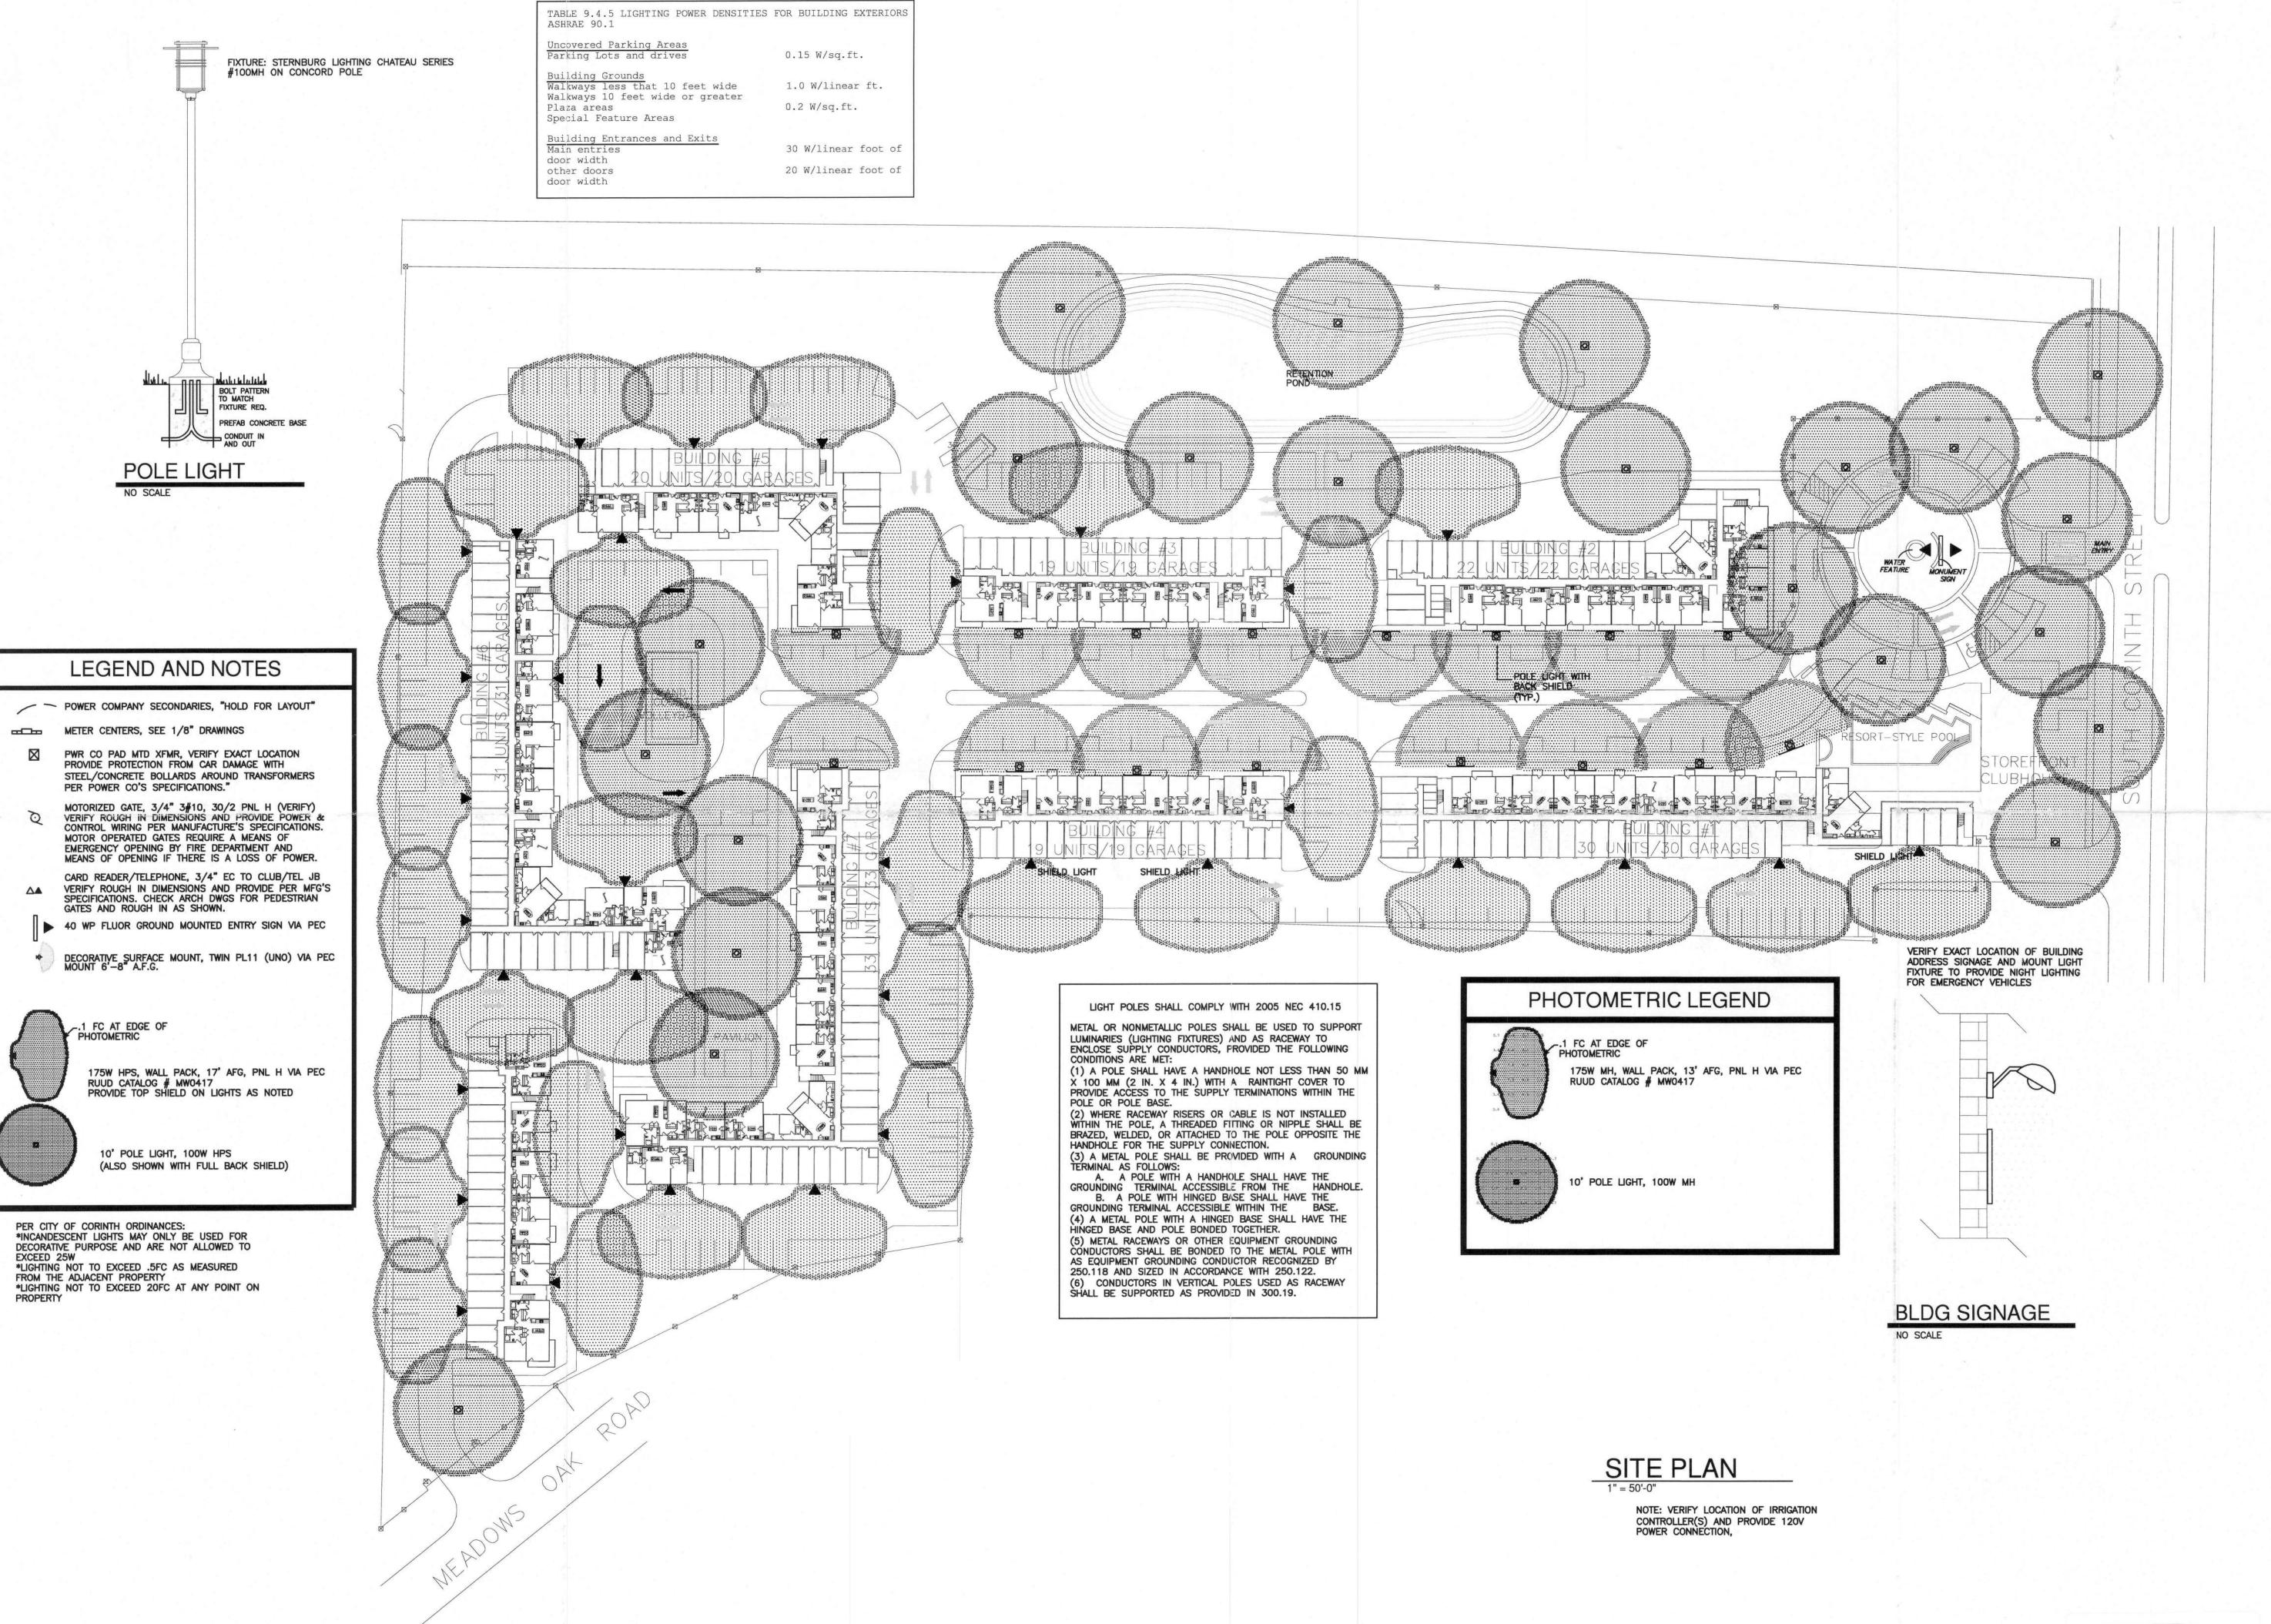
EXHIBIT "B" ORDINANCE #09-10-15-20 SITE PLAN - LANDSCAPE
